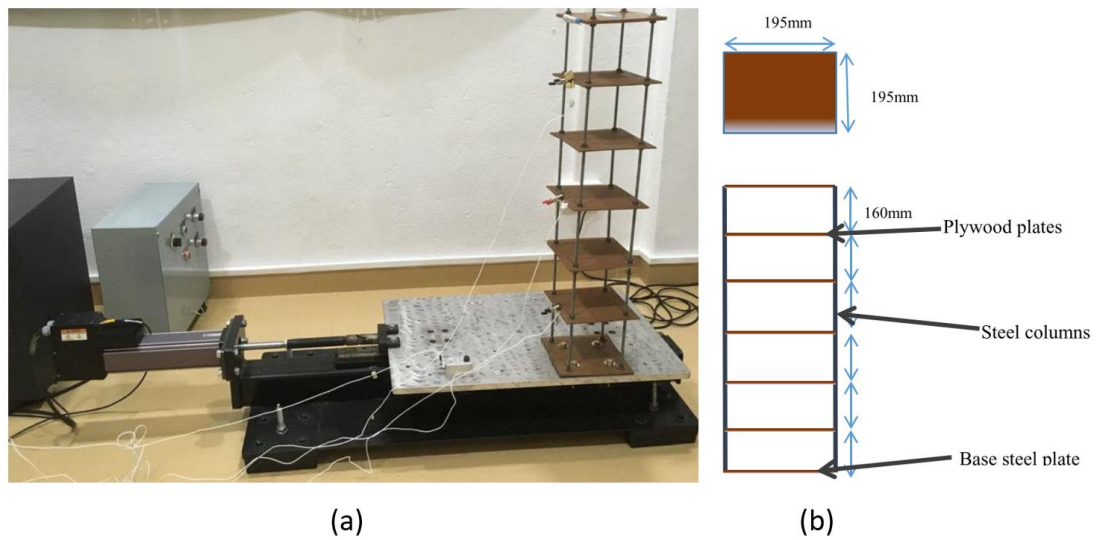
(a) Shake table test setup and (b) dimension of the tested structure [35]
